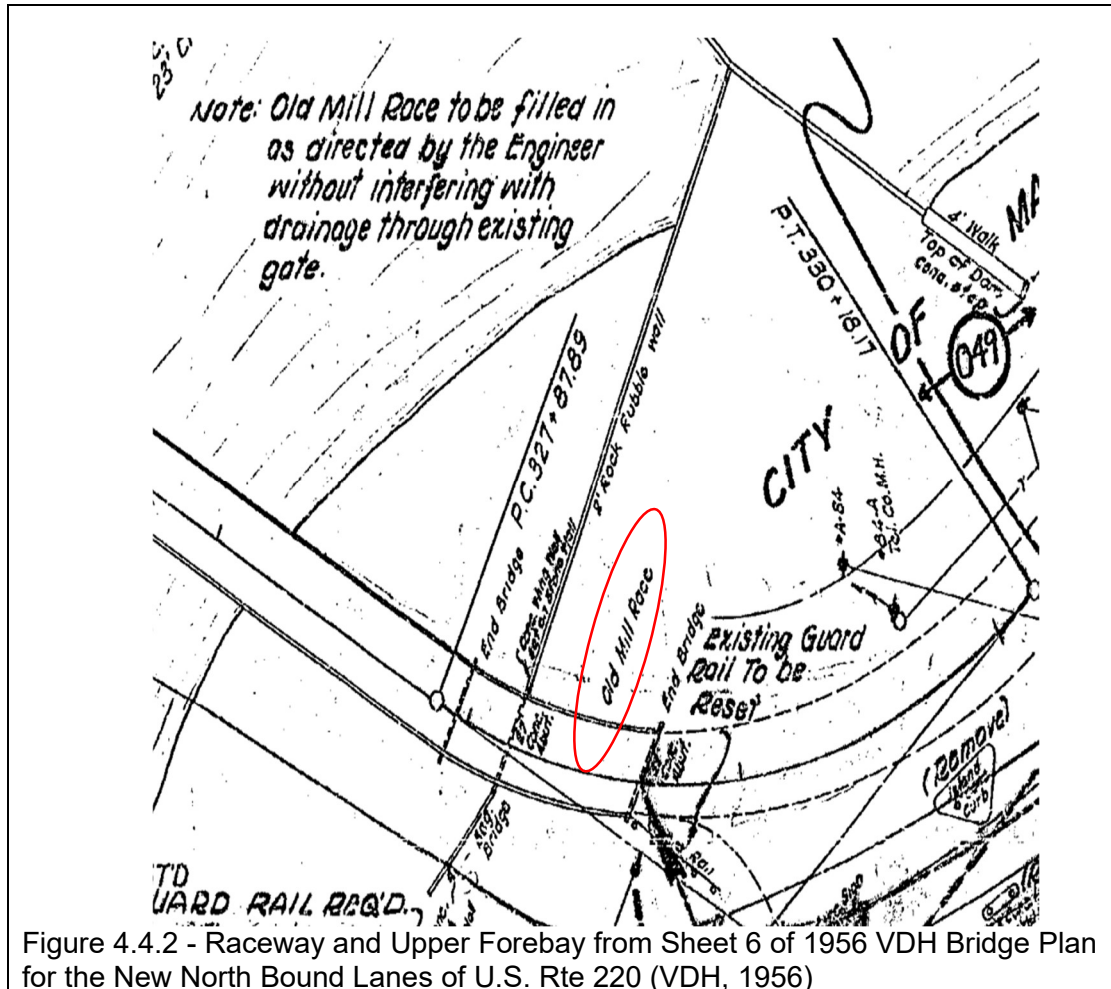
Raceway and Upper Forebay from Sheet 6 of 1956 VDH Bridge Plan for the New North Bound Lanes of U.S. Rte 220 (VDH, 1956)
